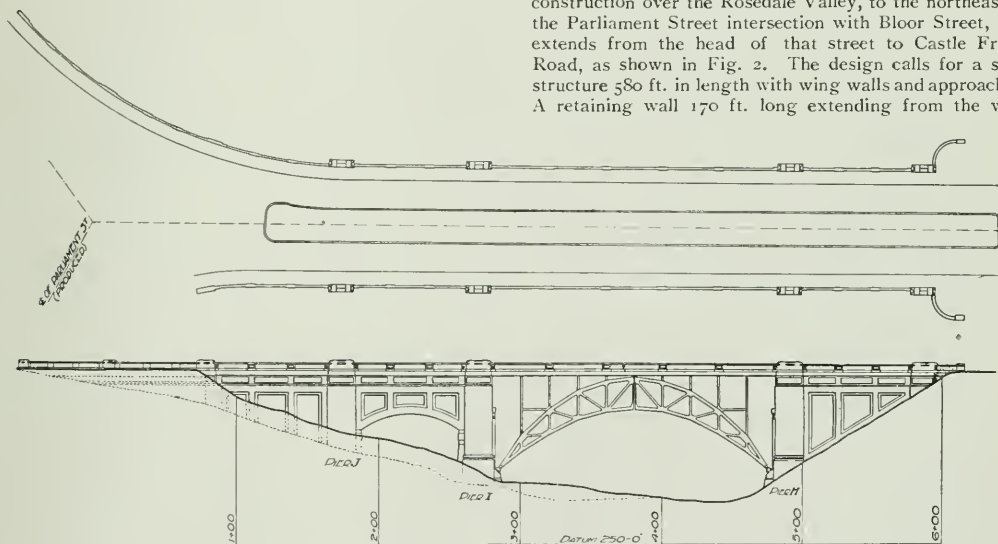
Plan and Elevation of the Proposed Rosedale Section of the Bloor Street Viaduct, Toronto.
